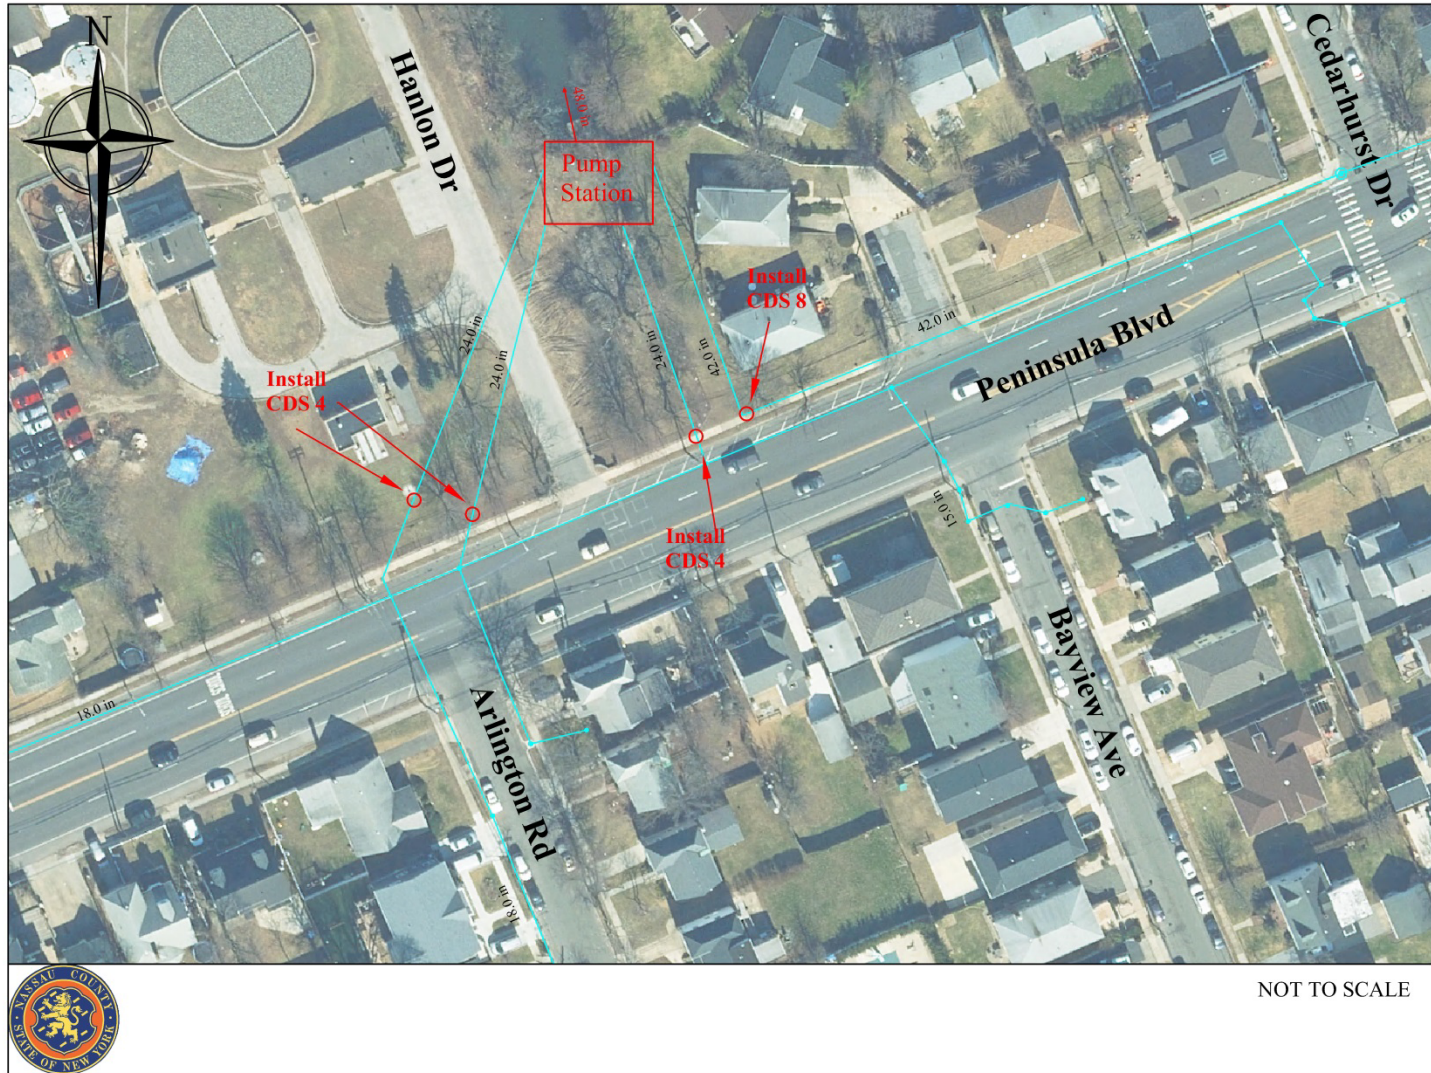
Cedarhurst Plan 2 - Recommended Pump Station
